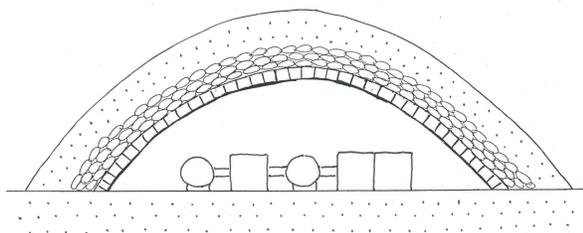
Industrial building of arched structure and of great inner space on the Lunar surface
